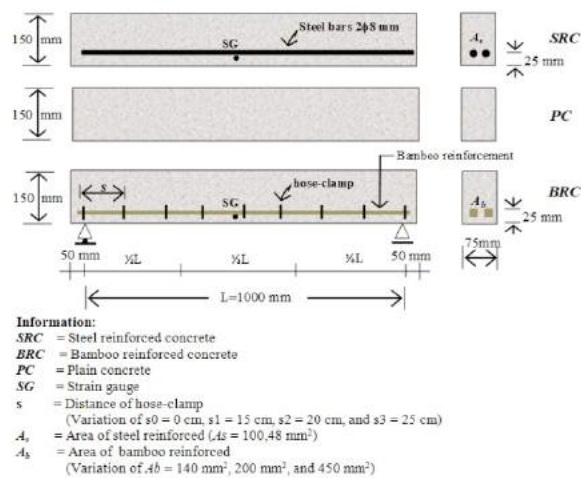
Geometry and details of bamboo-reinforced concrete beams.
